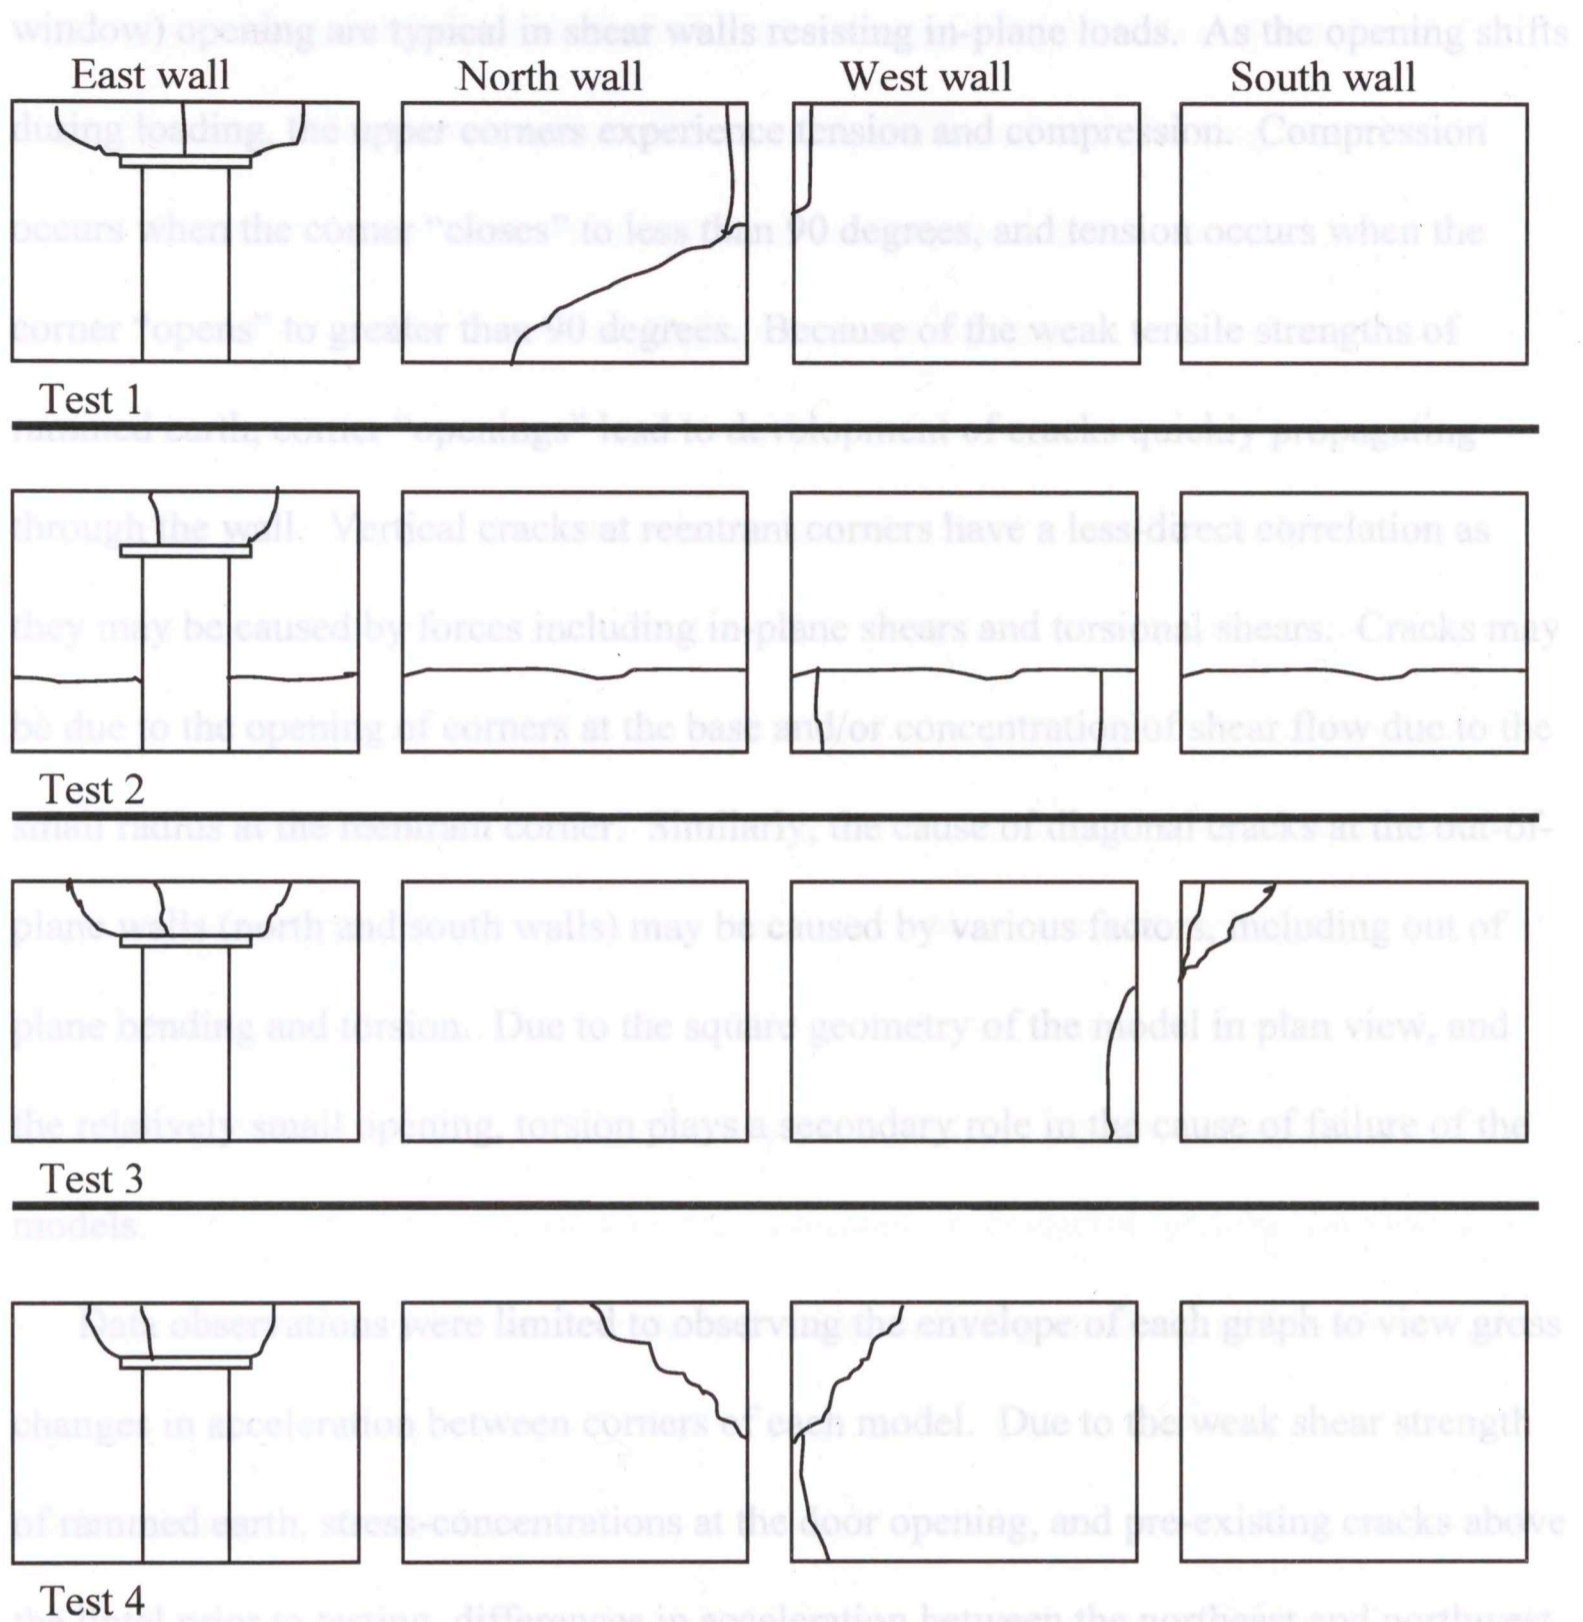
Summary of cracks on exterior walls of all models
